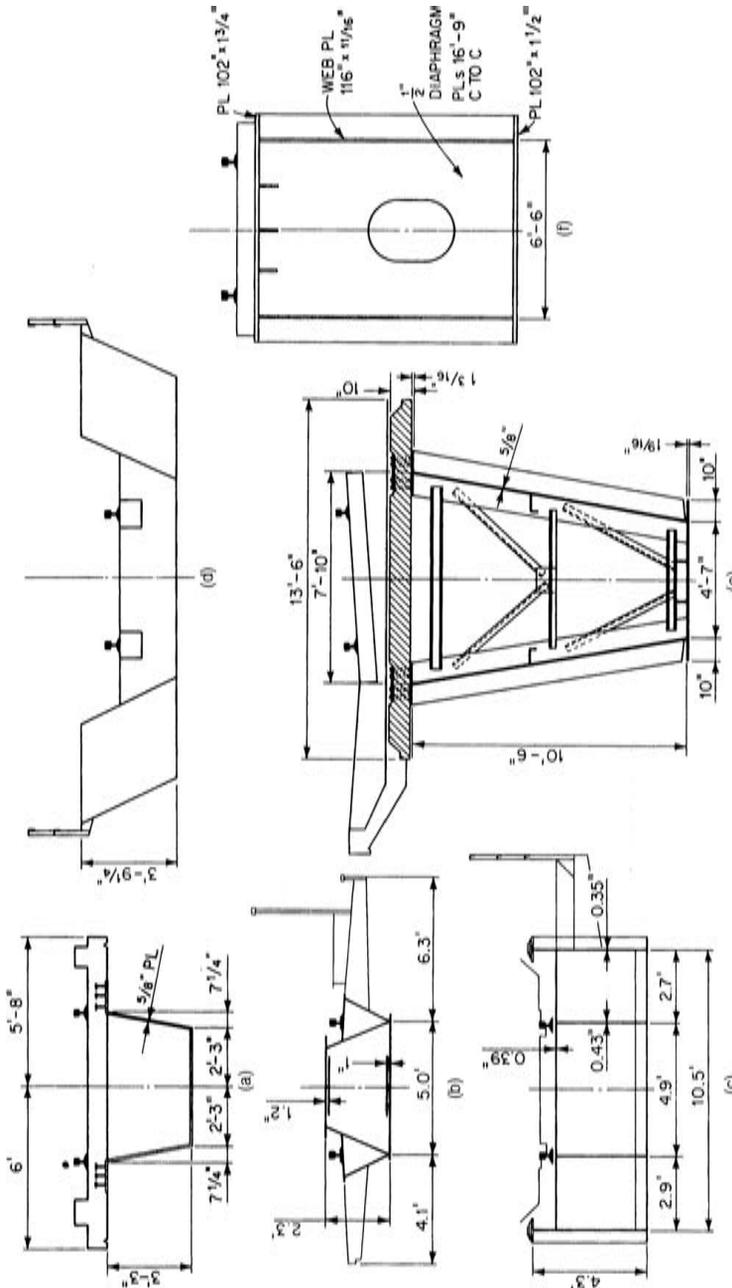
Examples of cross sections of railroad box-girder bridges. (a) Composite girder with 85-ft span for elevated rapid-transit system, San Francisco, Calif. (b) Rails bear directly on steel box of 56-ft span over Autobahn, Kirchweyhe, Bremen, Germany. (c) Three-cell box over Abstrasse, M-Gladbach, Germany, with 80-ft span. (d) Rigid-frame construction with 117-ft span carries track with radius of 1780 ft, near Frankfurt, Germany. (e) Precast-concrete deck bolted to girder for composite action in 152.5-ft span, Czech Republic. (f) Typical section of four 122-ft spans in Chester, Pa.
